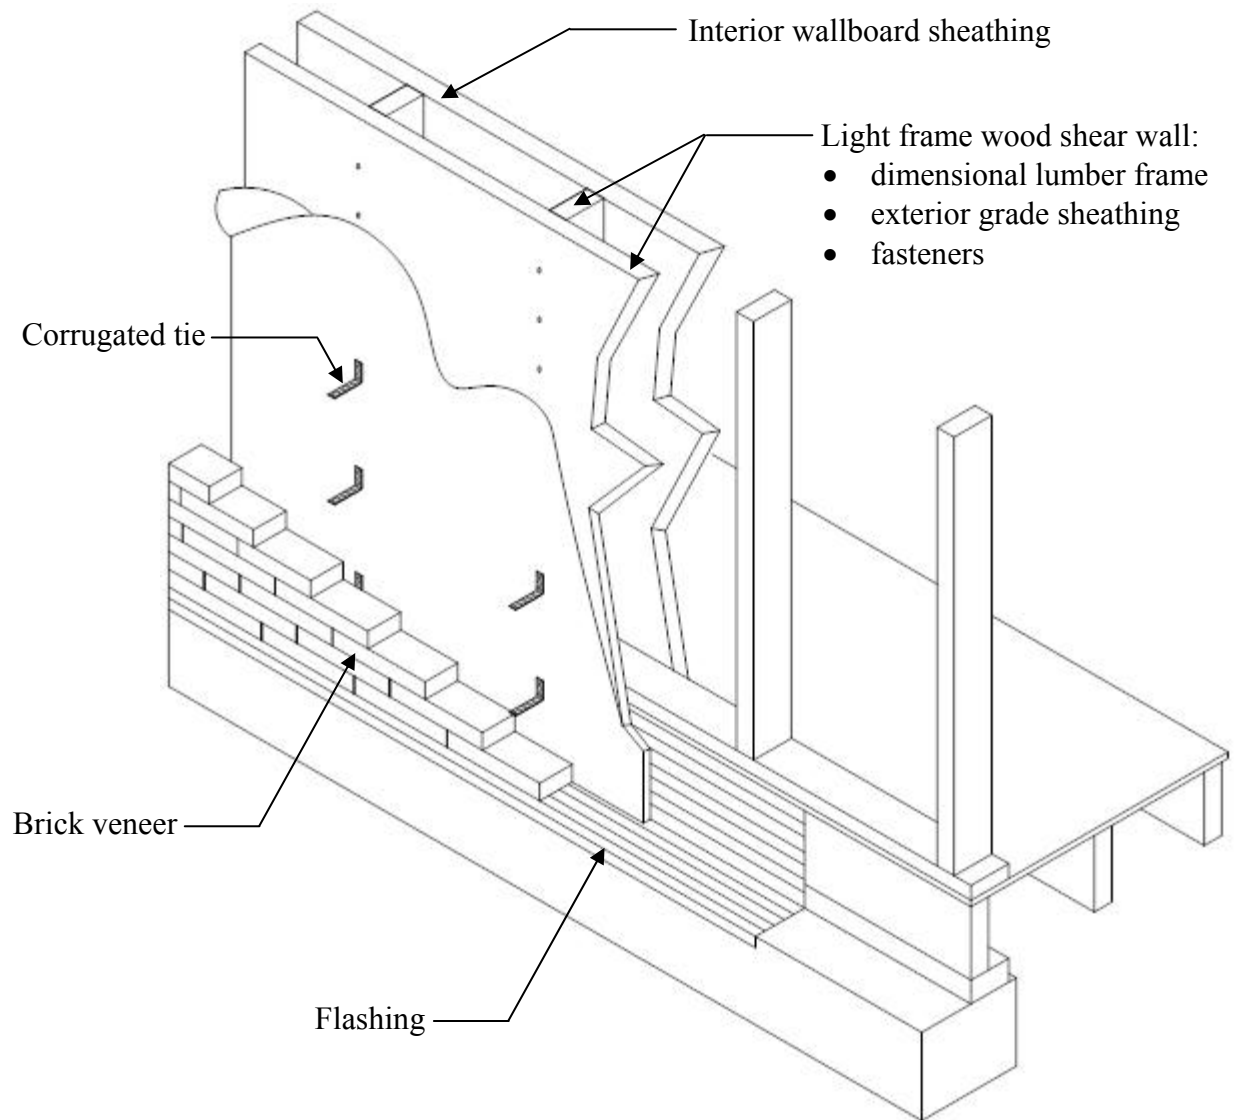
Components of an anchored brick veneer – light frame wood shear wall
